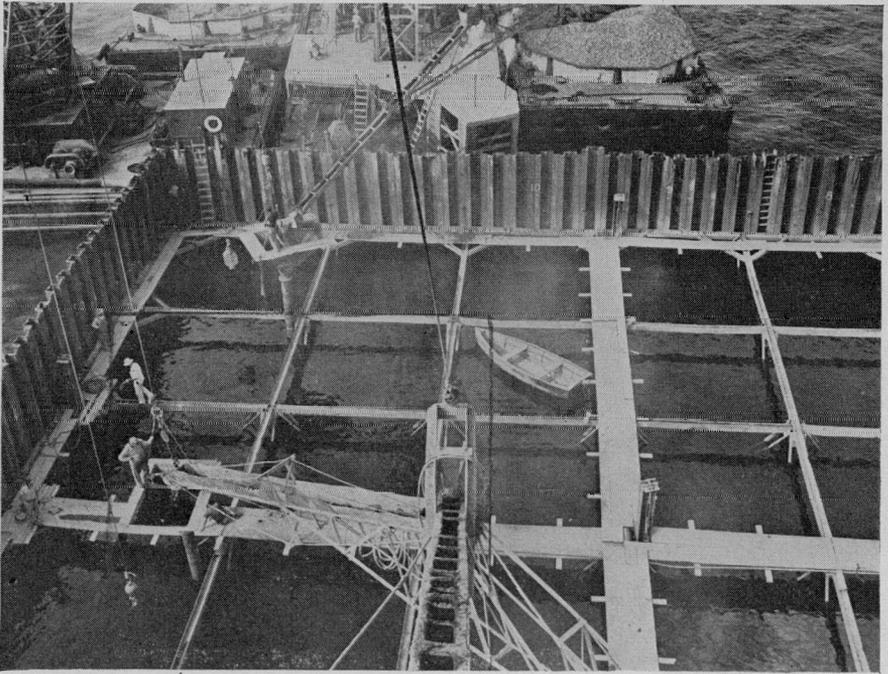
EAST ANCHORAGE PIER COFFER DAM DURING PLACEMENT OF TREMIE SEAL.
